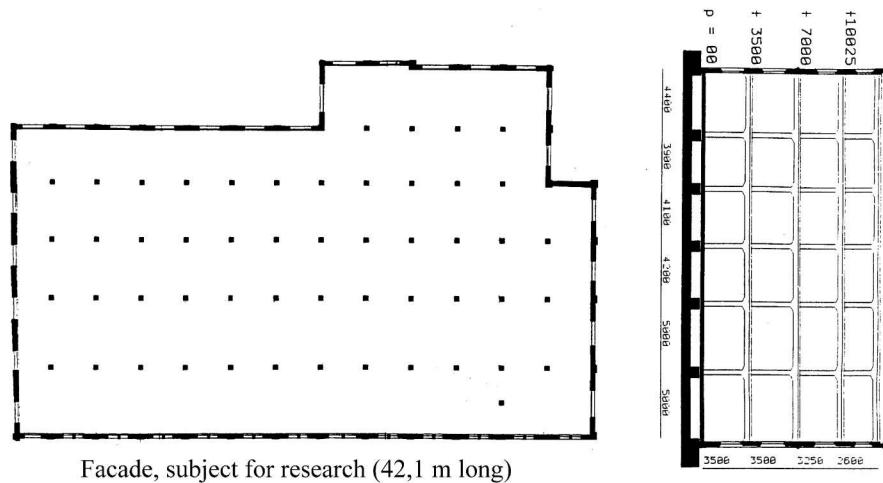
Floor plan and cross-section of ‘De Adelaar’
